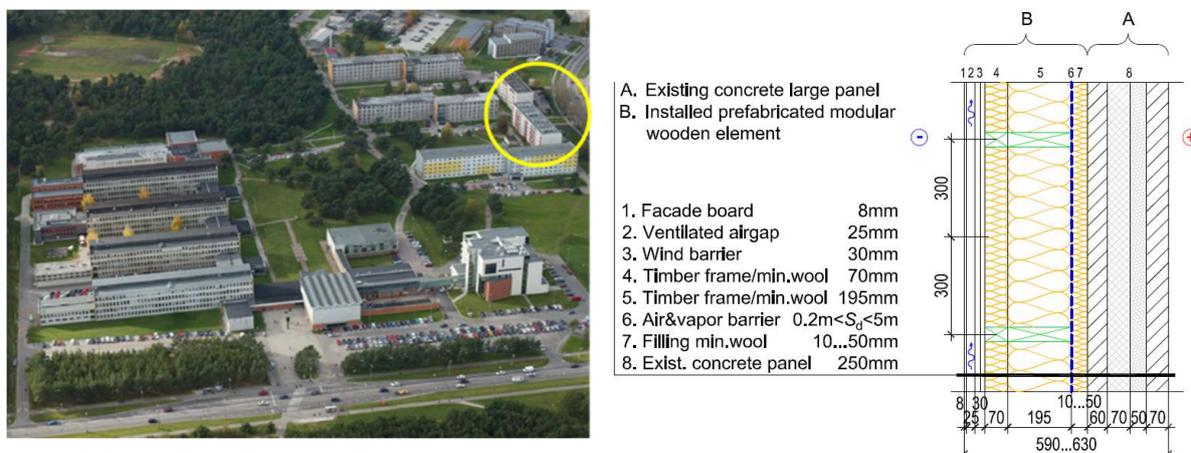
Location of the pilot building at TUT campus in Tallinn, Estonia (left) and basic design of wall insulation modules, placed onto the existing concrete wall (right).
